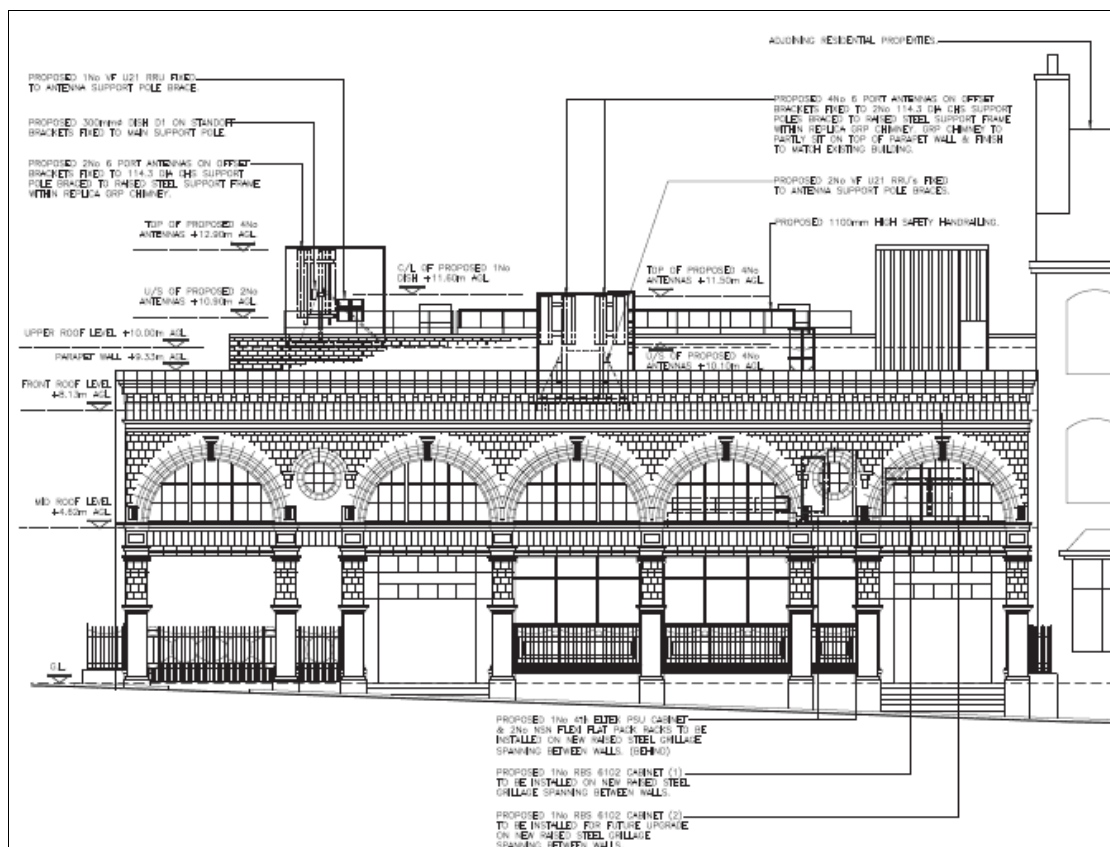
Proposed rooftop installation at Belsize Park Underground Station. The planning application had to be withdrawn before the LPA registered it as TfL no longer wished to permit the installation.
